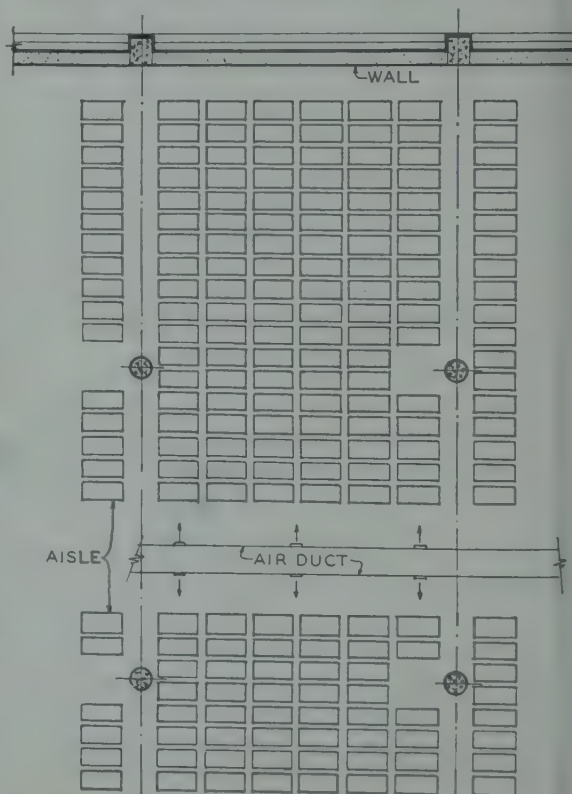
Typical Stacking Arrangement for Lemons and Grapefruit.
